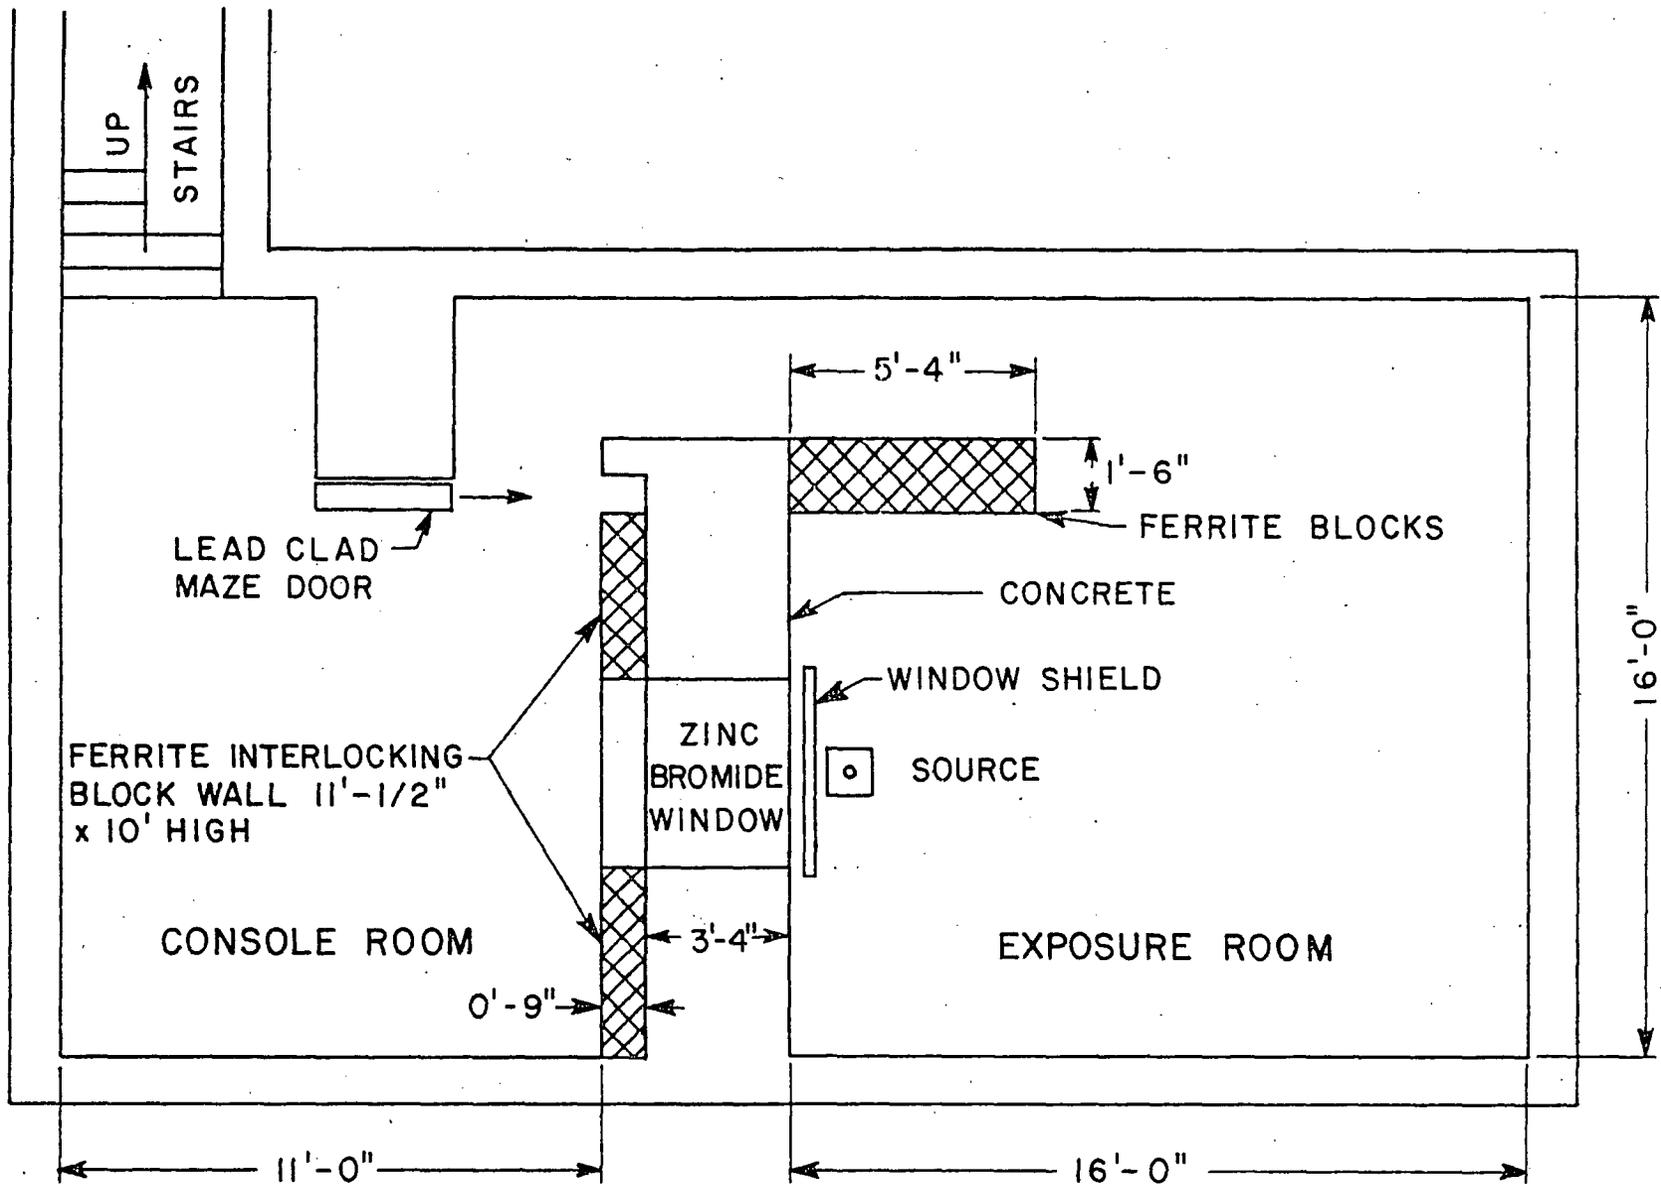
PLAN VIEW UNDERGROUND VAULT
